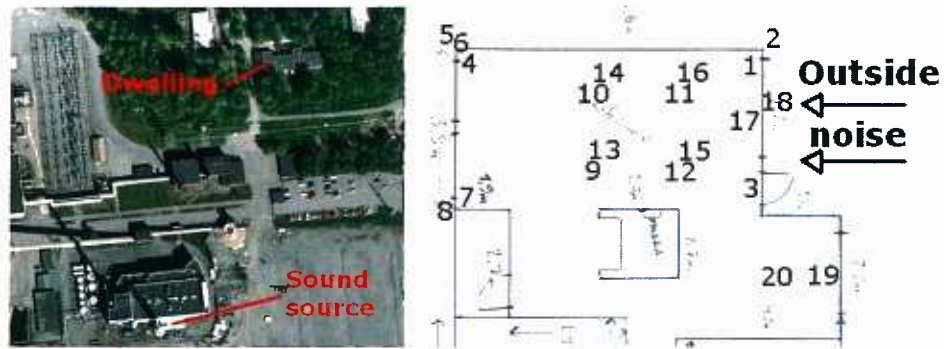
Left) Air photo of Case 2. The locations of the sound source the and dwelling are indicated. Right) Floor plan of the living room from Case 2. The measurement locations are shown.
